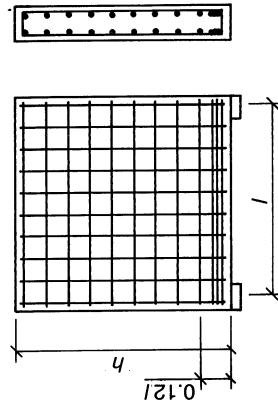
Distribution of longitudinal reinforcement in a deep beam in case of direct loading (schematic)
